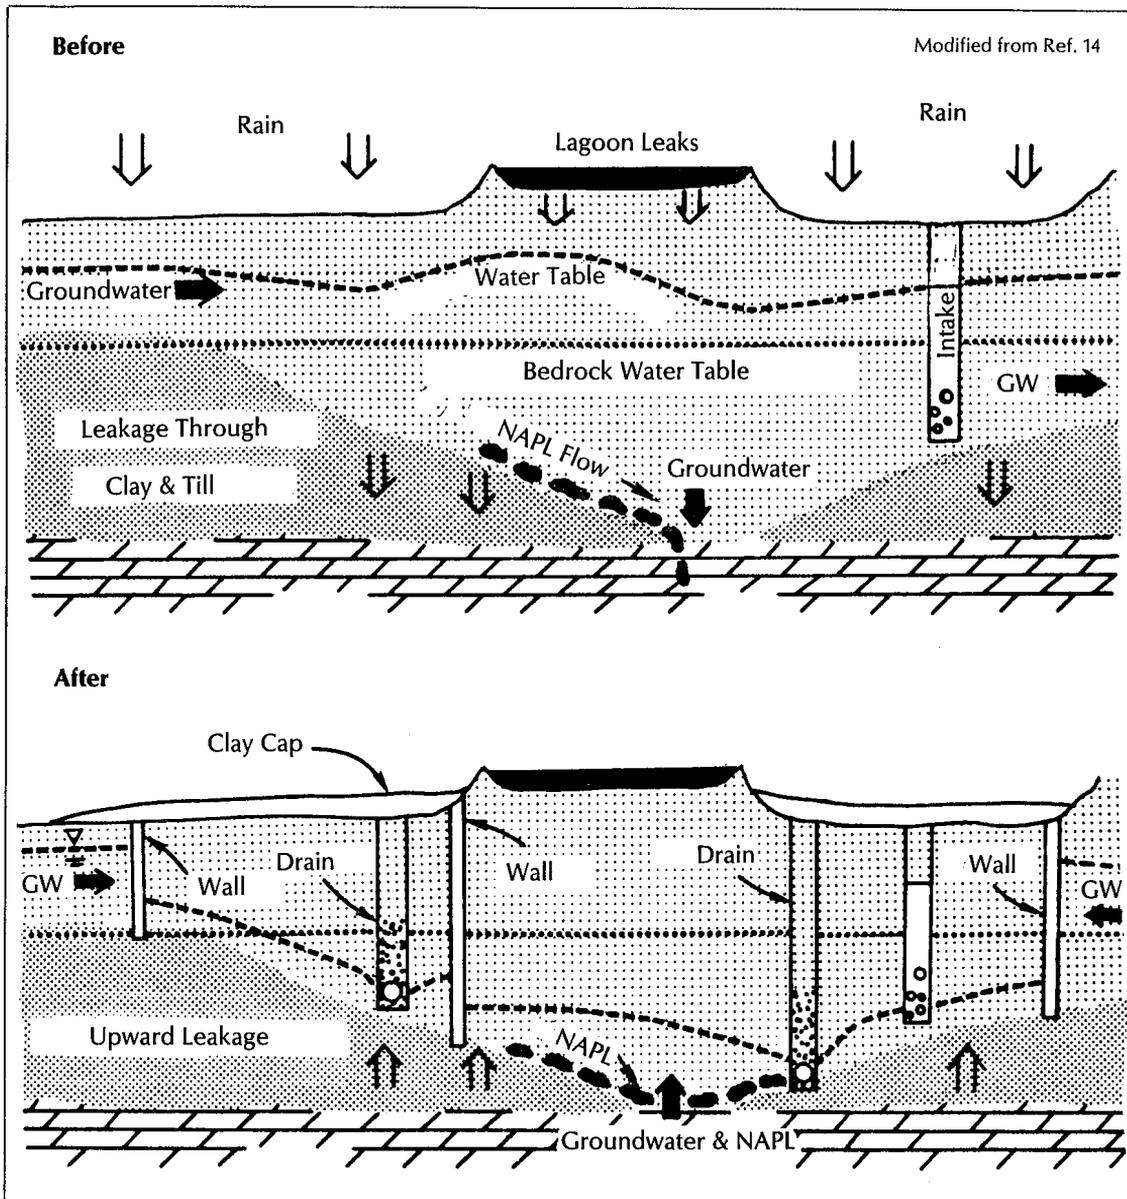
A conceptual cross-section of the hydraulic containment system to be implemented at the S-Area landfill.
